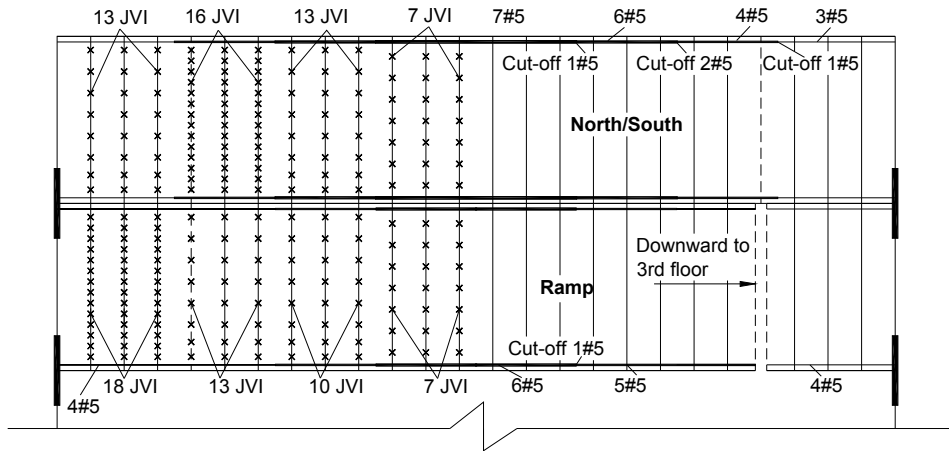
Diaphragm reinforcement at top floor for example 1C.
